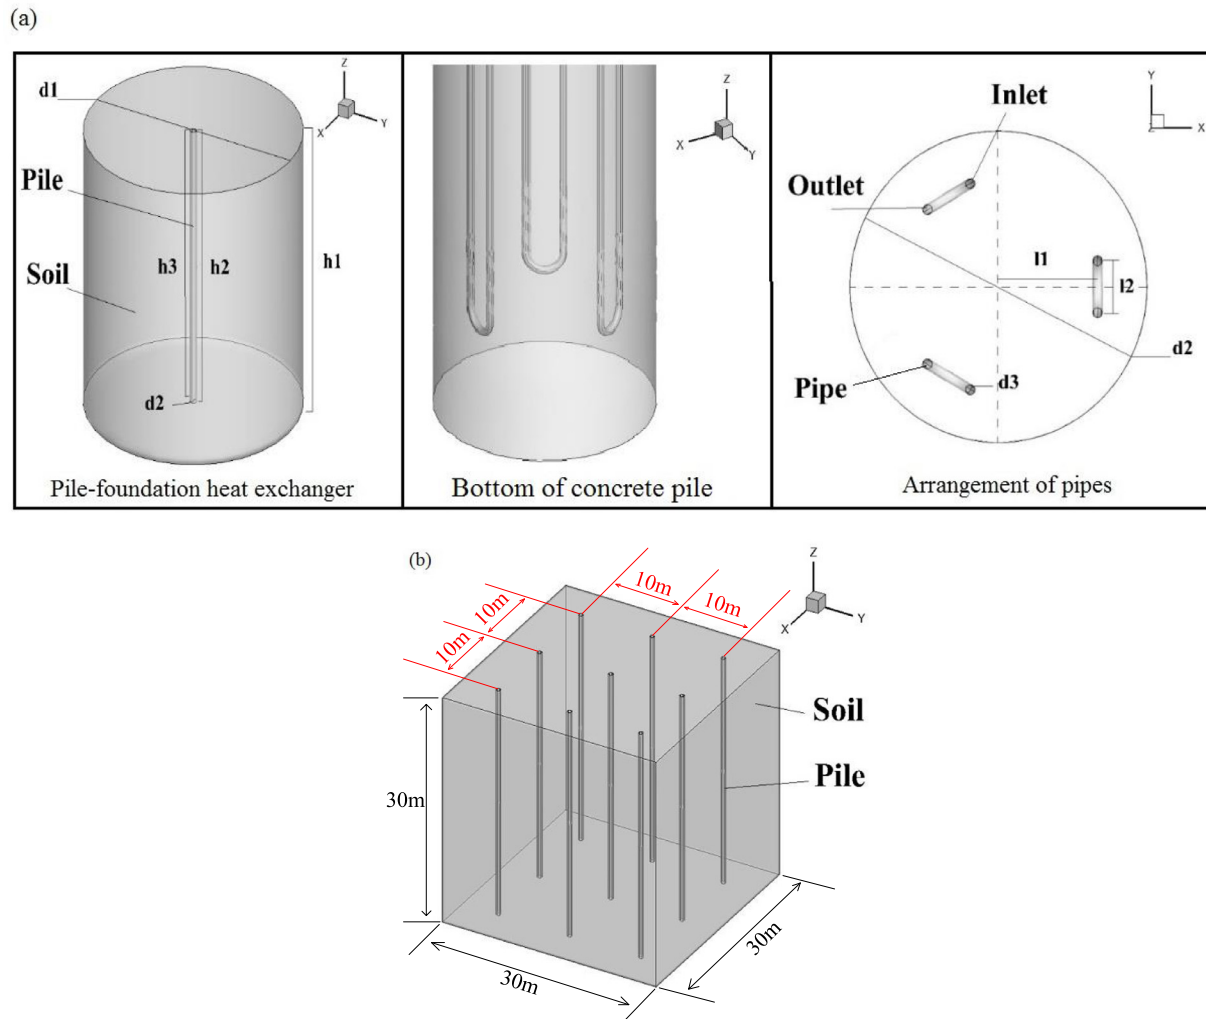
Physical models and specifications (a. Pile-foundation heat exchanger; b. Pile-foundation heat exchanger group).
